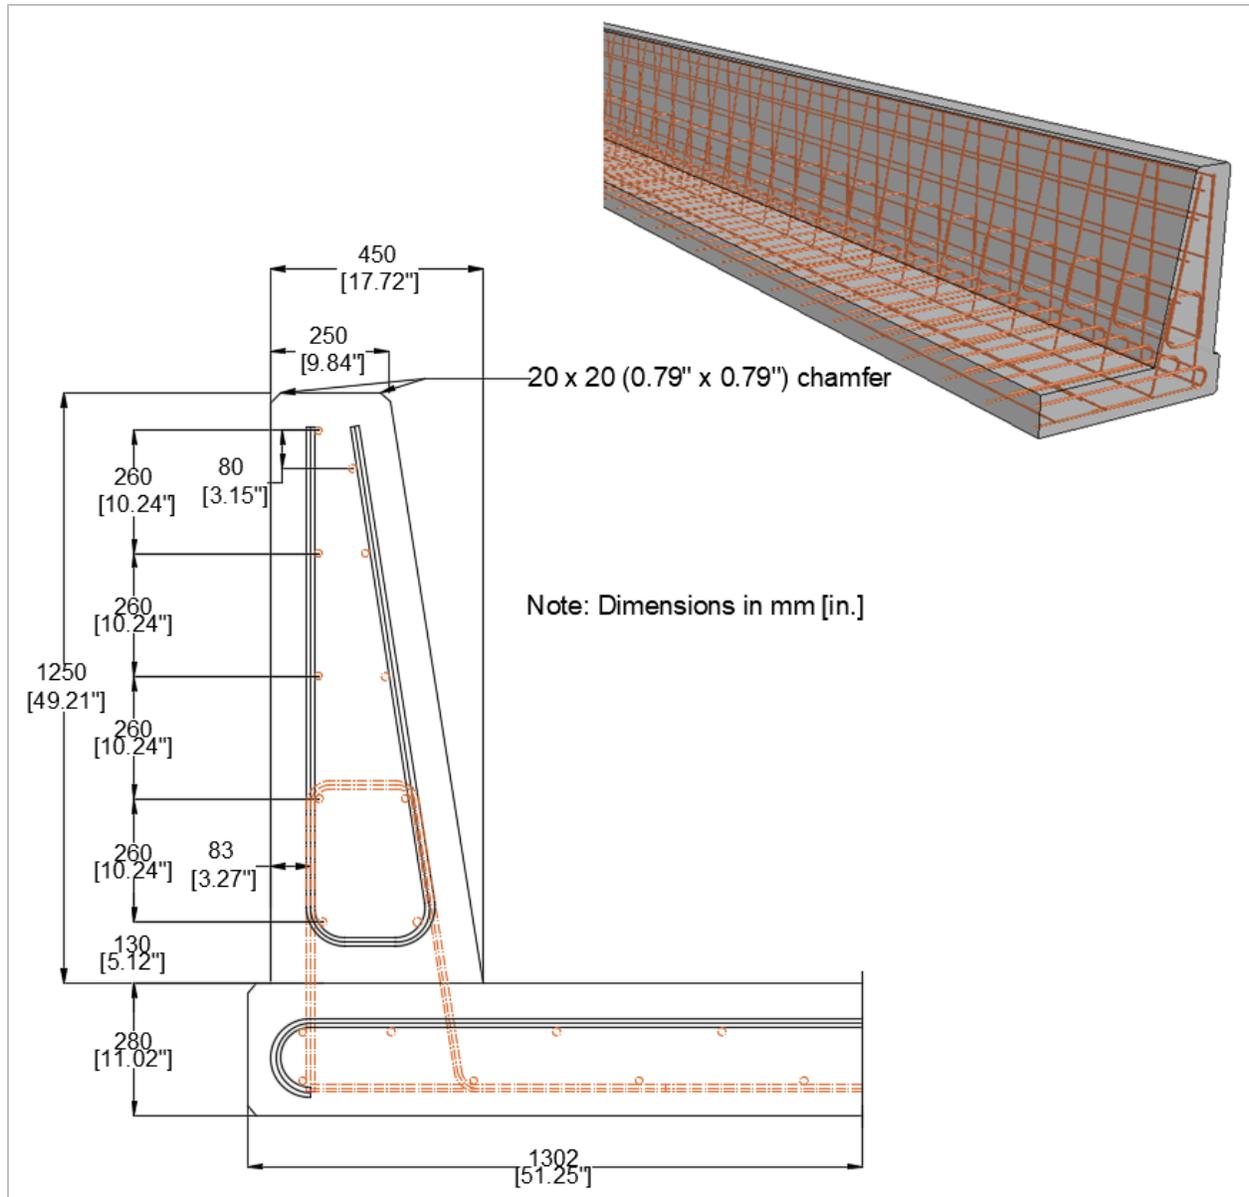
Cross-section and layout of Manitoba concrete bridge rail FEA model.
